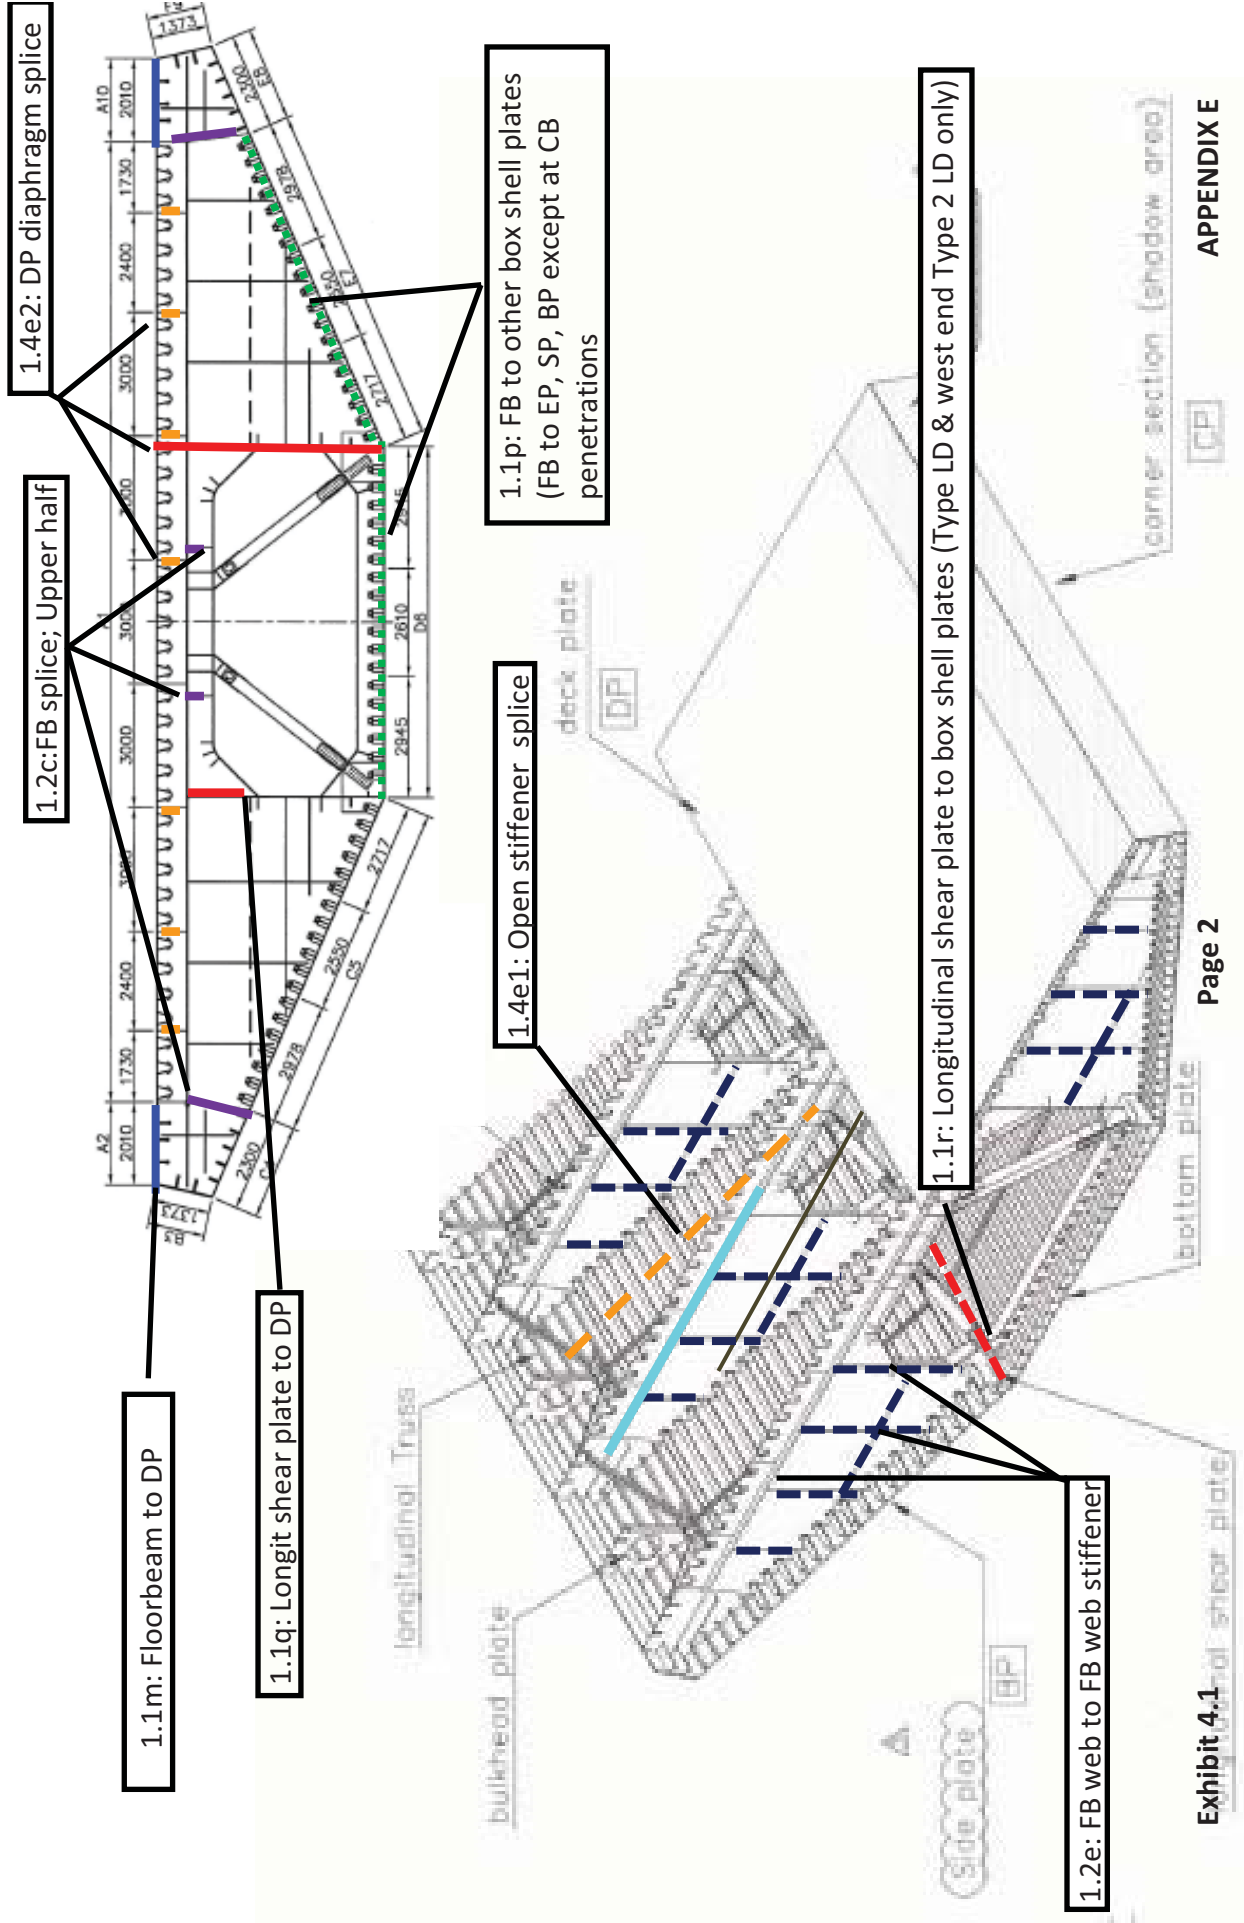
Lifts 1 - 12 Pure FCAW Welds Made with Old Welding Process and Contract Required NDT Less Than 100%
